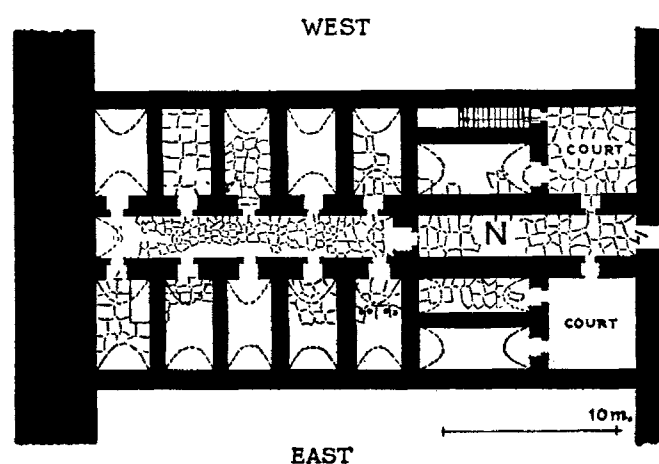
GROUND PLAN OF STOREHOUSE *N
